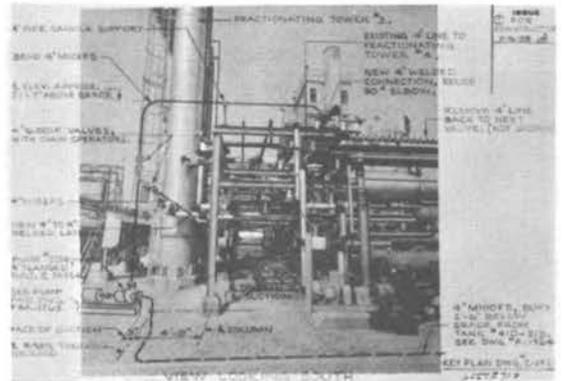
Typical completed piping photo-drawing for a revision to an existing facility.
